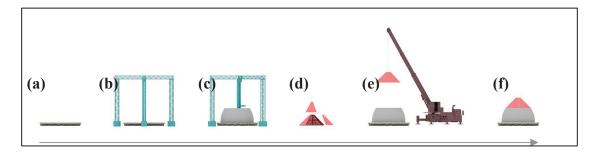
Sequential construction process. (a), base setup. (b), frame assembly. (c), 3D printing the structure. (d), assembling the prefabricated components. (e), installing the assembled structure. (f), final house
